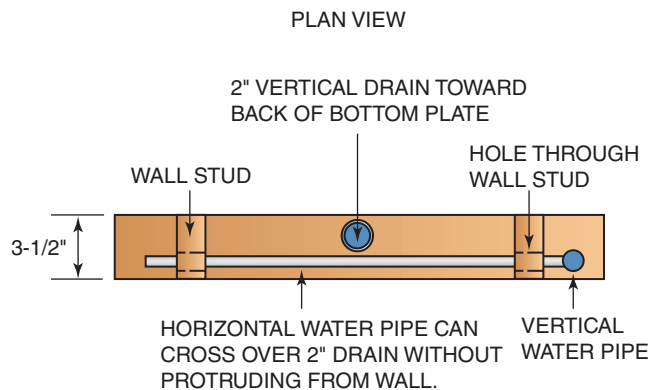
A 2" pipe in a 2" x 4" wall must be installed toward one side of the wall to accommodate a horizontal water line.
